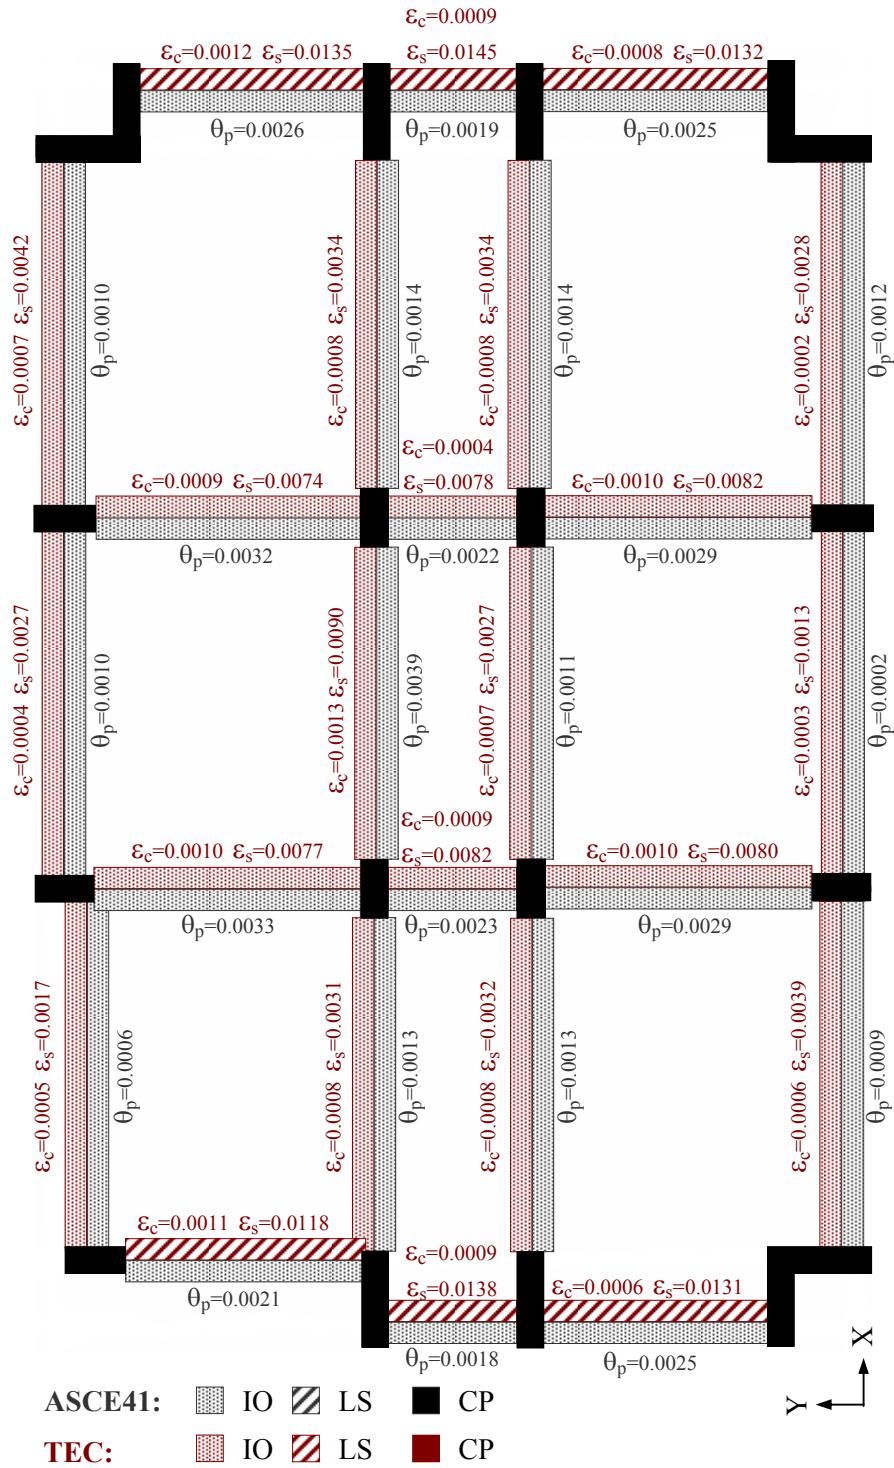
Comparative assessment of second floor beams in the Bingöl building as per ASCE/SEI-41 and TEC 2007
